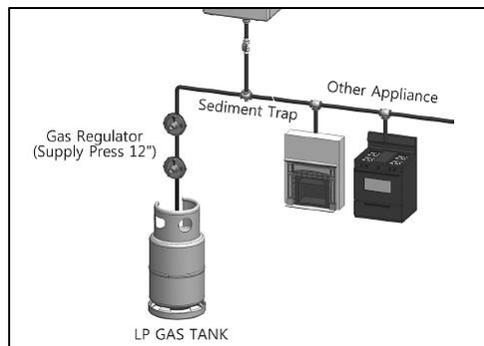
LP Gas Piping Installation – NOTE: Capacity to be Not Less than Total Capacity of Connected Boilers
